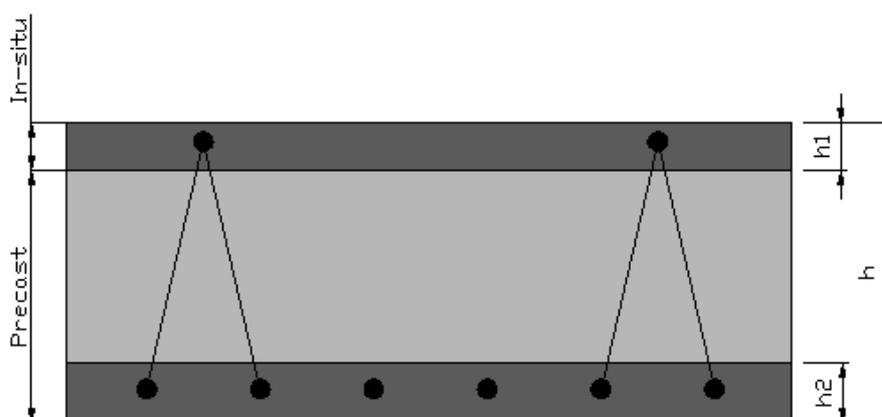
Principles of the Lightweight Concrete Sandwich Slab concept.
